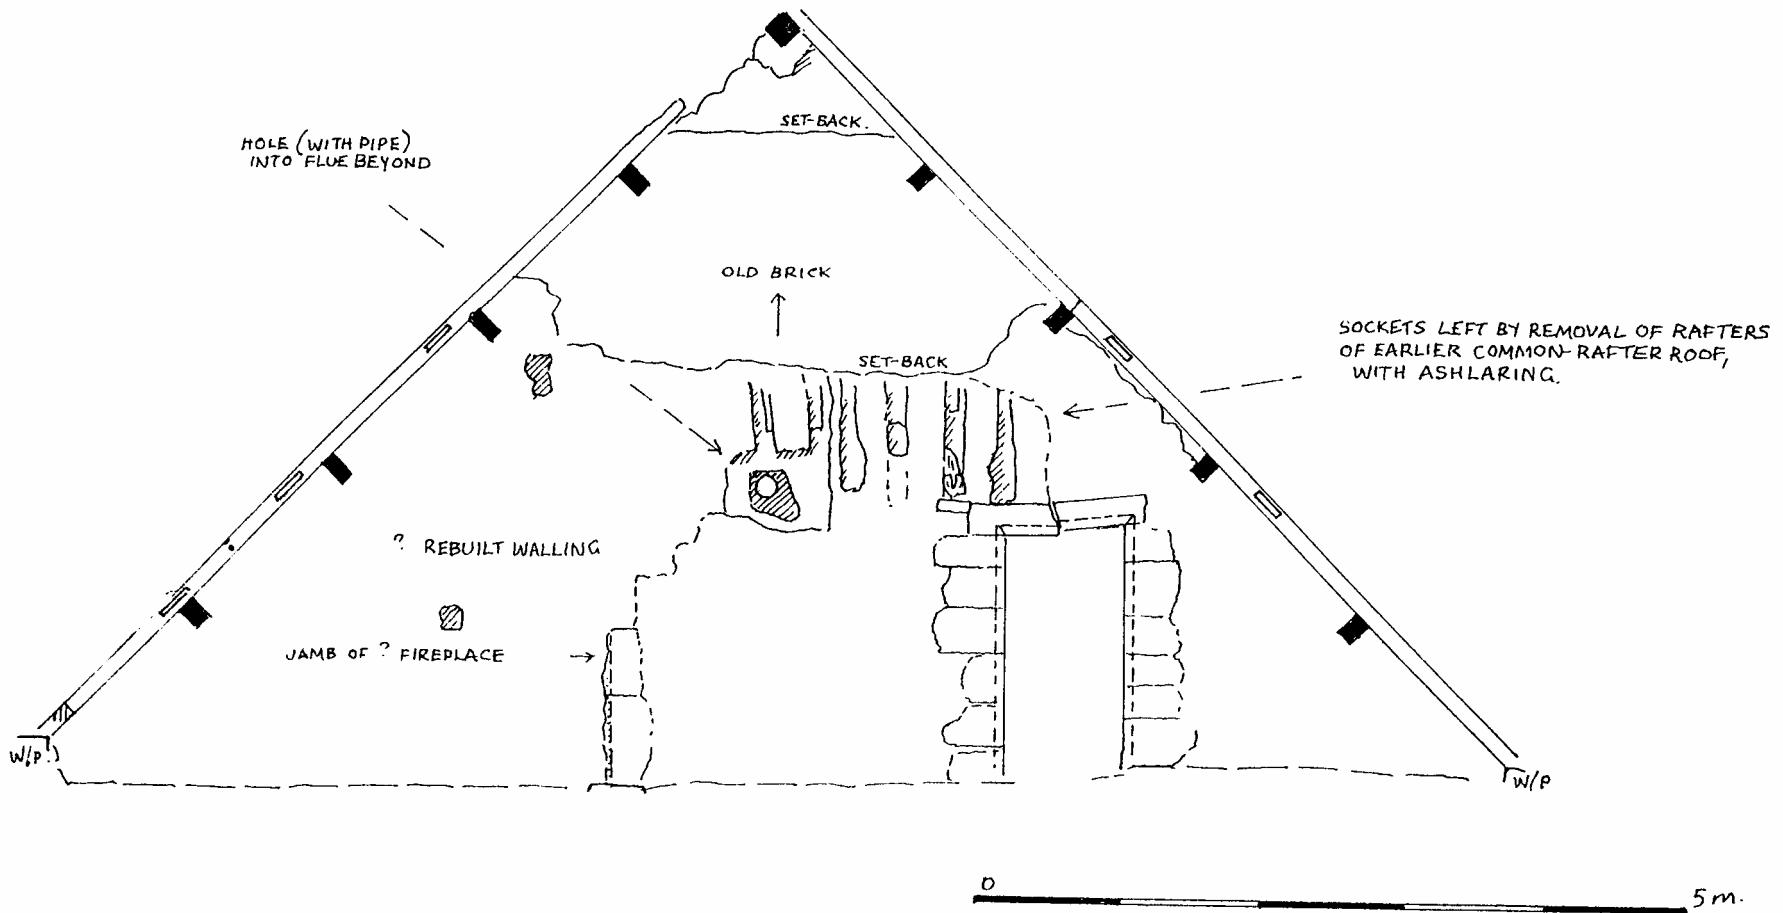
Low Harperley farmhouse; main building, attic of east wing; section looking north (Peter Ryder)
